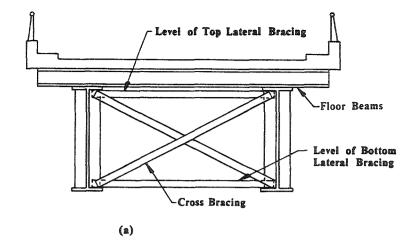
Typical Configurations of Cross Bracing, Cross Frames and Cross Trusses
